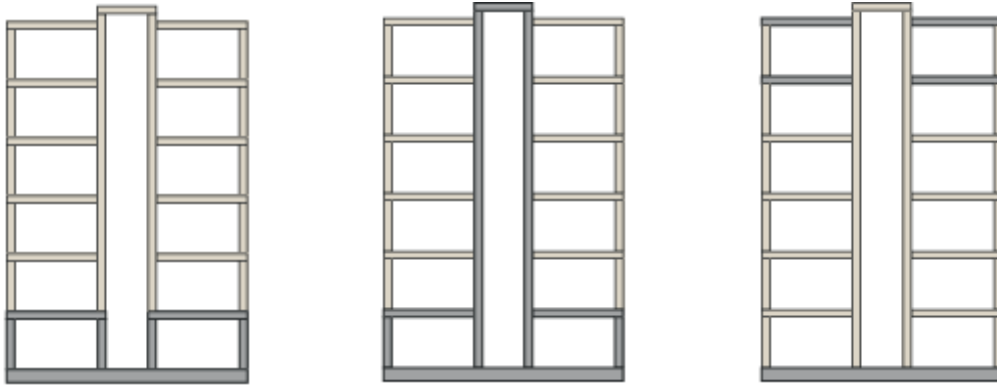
Concrete-timber hybrid structures (Vos & Jackson, 2024)
